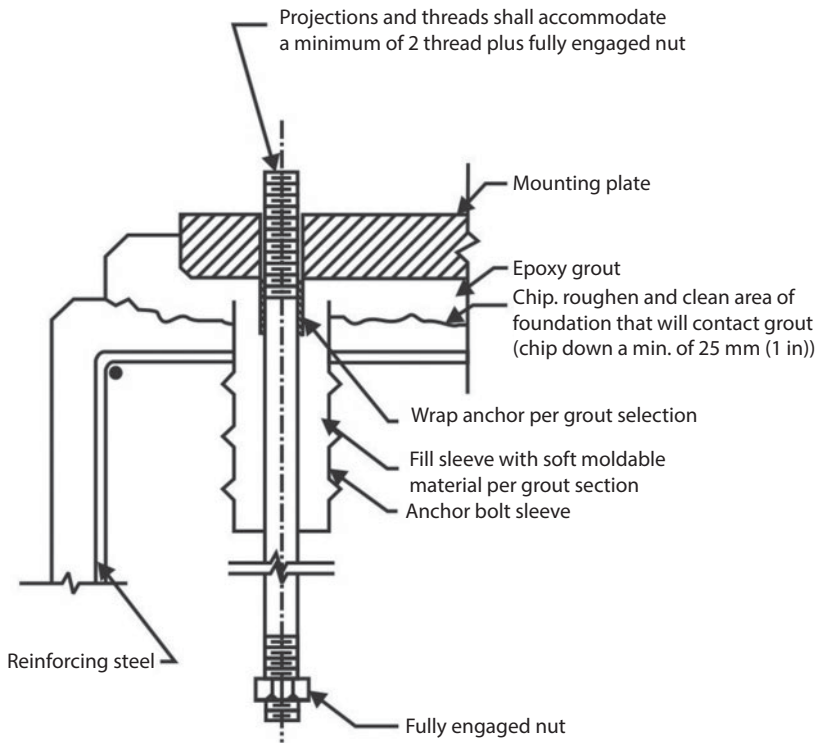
Notice the installation of the anchor bolt, mounting plate, rebar, chamfered edge for the concrete and grout, protective anchor bolt sleeve and mounting plate.
